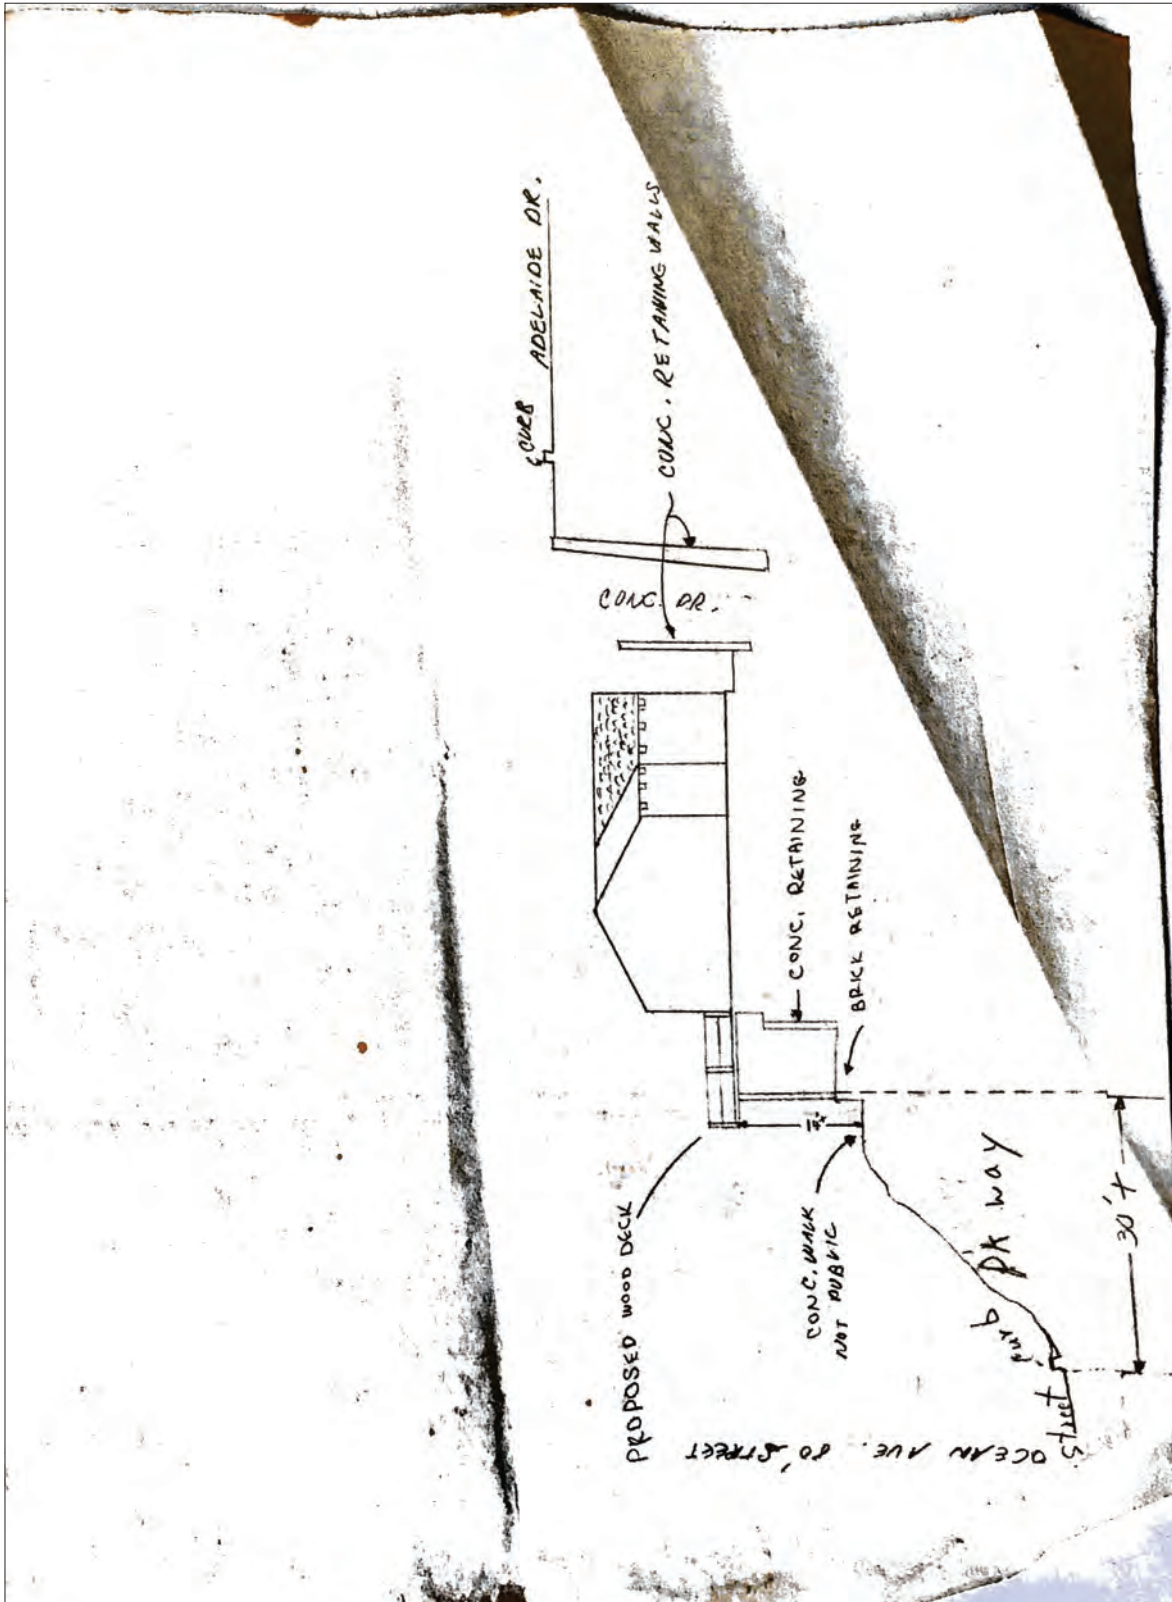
Section drawing for deck construction and doorway to house (Isherwood Bachardy Archive, 1962)
